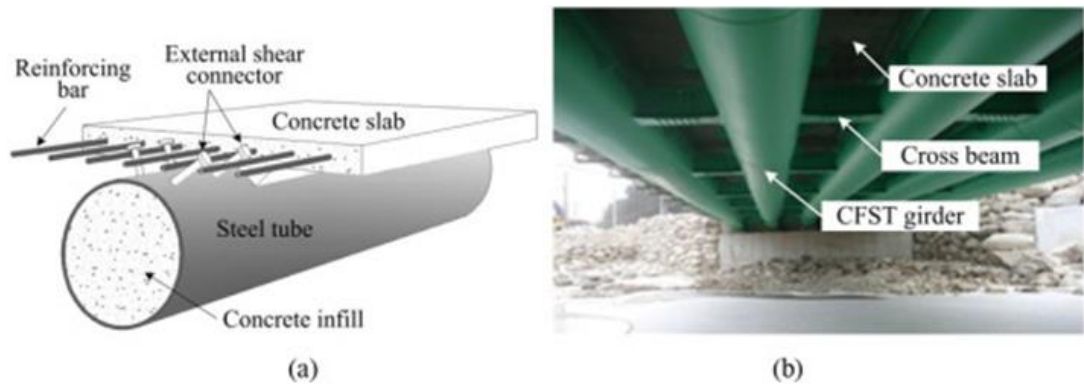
(a) Schematic view of CFST composite girder, and (b) Construction example [5]
